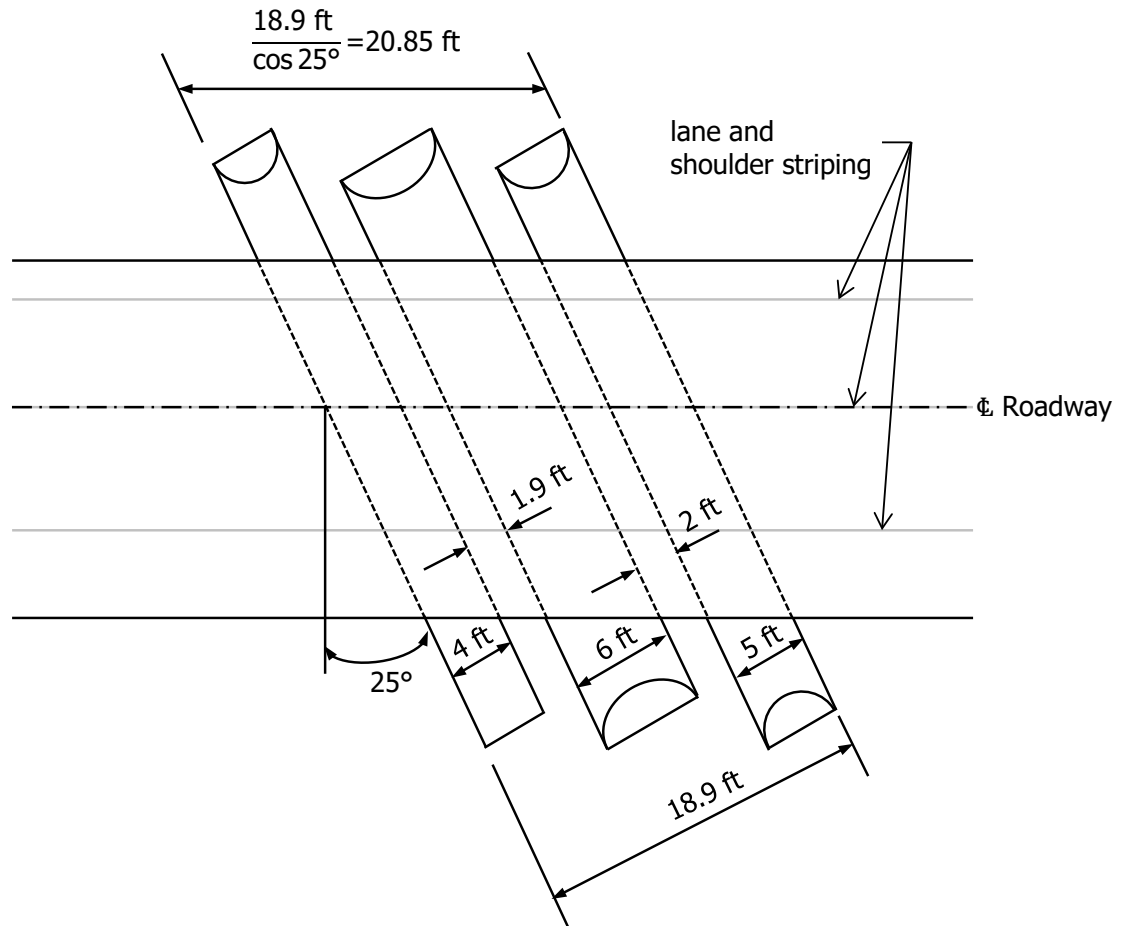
Plan view of a skewed, multi-pipe culvert under fill.
